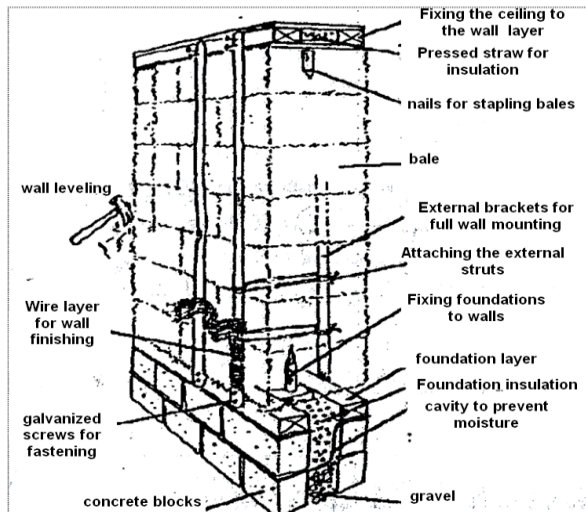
Bales stapling inside light-weight frame-reinforced load-bearing walls (Source: [14]).
